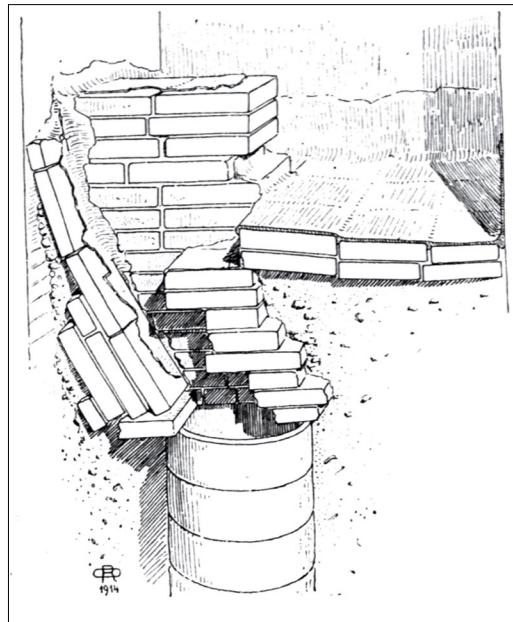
Installation in Room 13, House II (Miglus 1999, T. 108)
